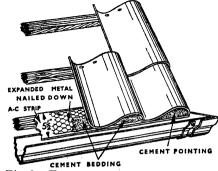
EAVES FINISH FOR SMALL PANTILE ROOF
